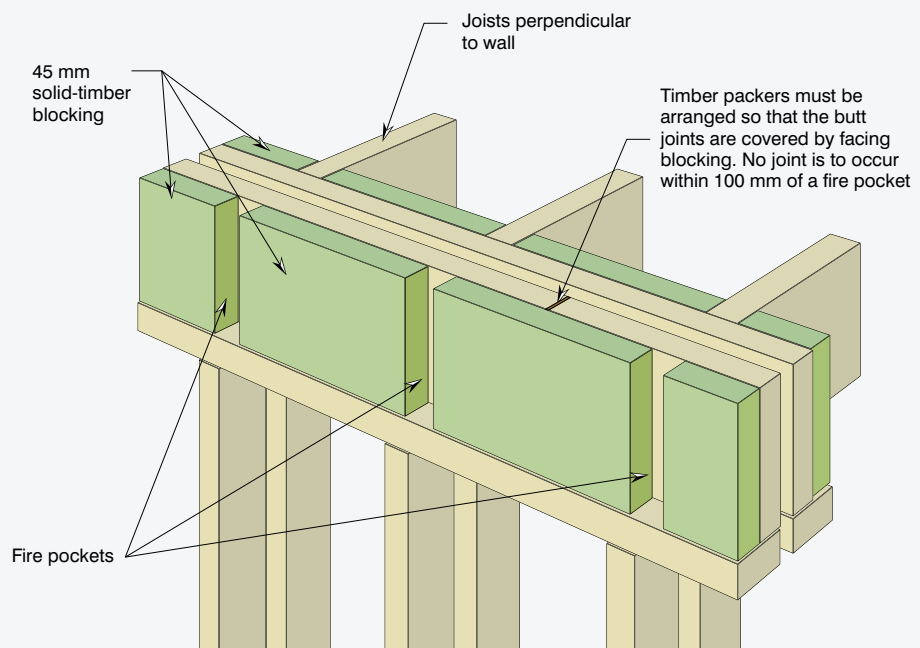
Pockets created in separating wall to accommodate floor joists – perspective view from above.
